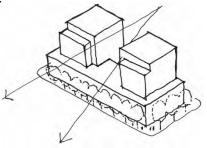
Slender building forms enhance daylight penetration and cooling through cross ventilation.
